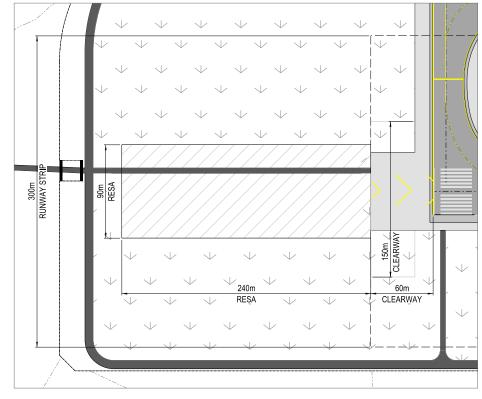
Runway 03R Runway End Safety Area layout Source: Perth Airport
